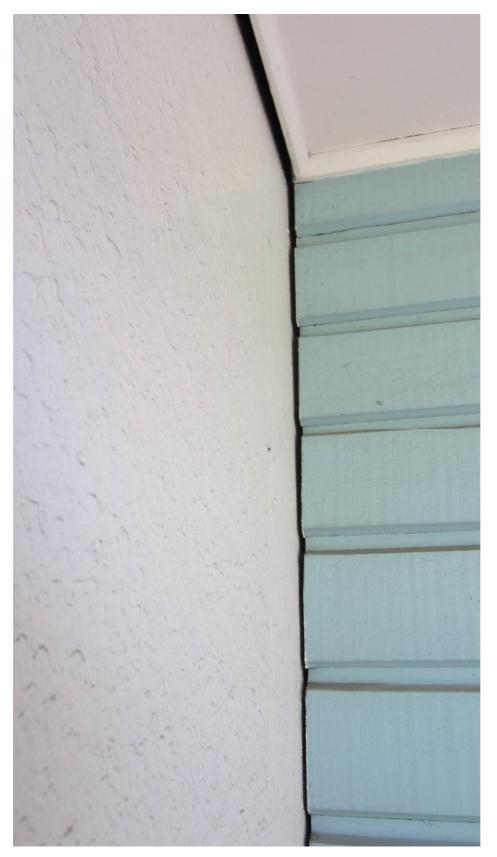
Centre precast concrete wall panel of Block B (view from north).Damage Description: Tilt and residual movement of precast reinforced concrete wall.
